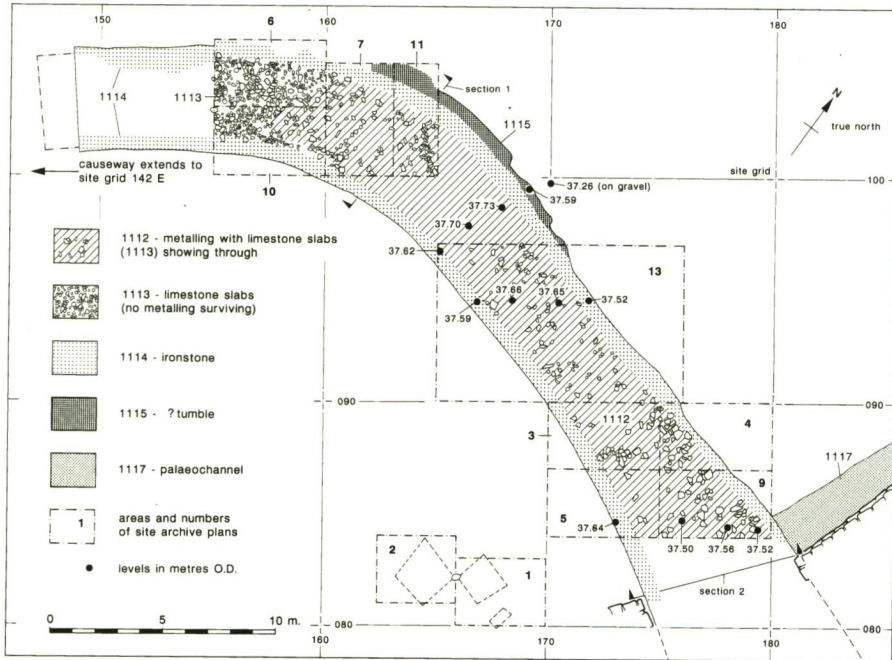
Ditchford Pit, Wellingborough: site plan of the medieval causeway showing all excavated areas.
